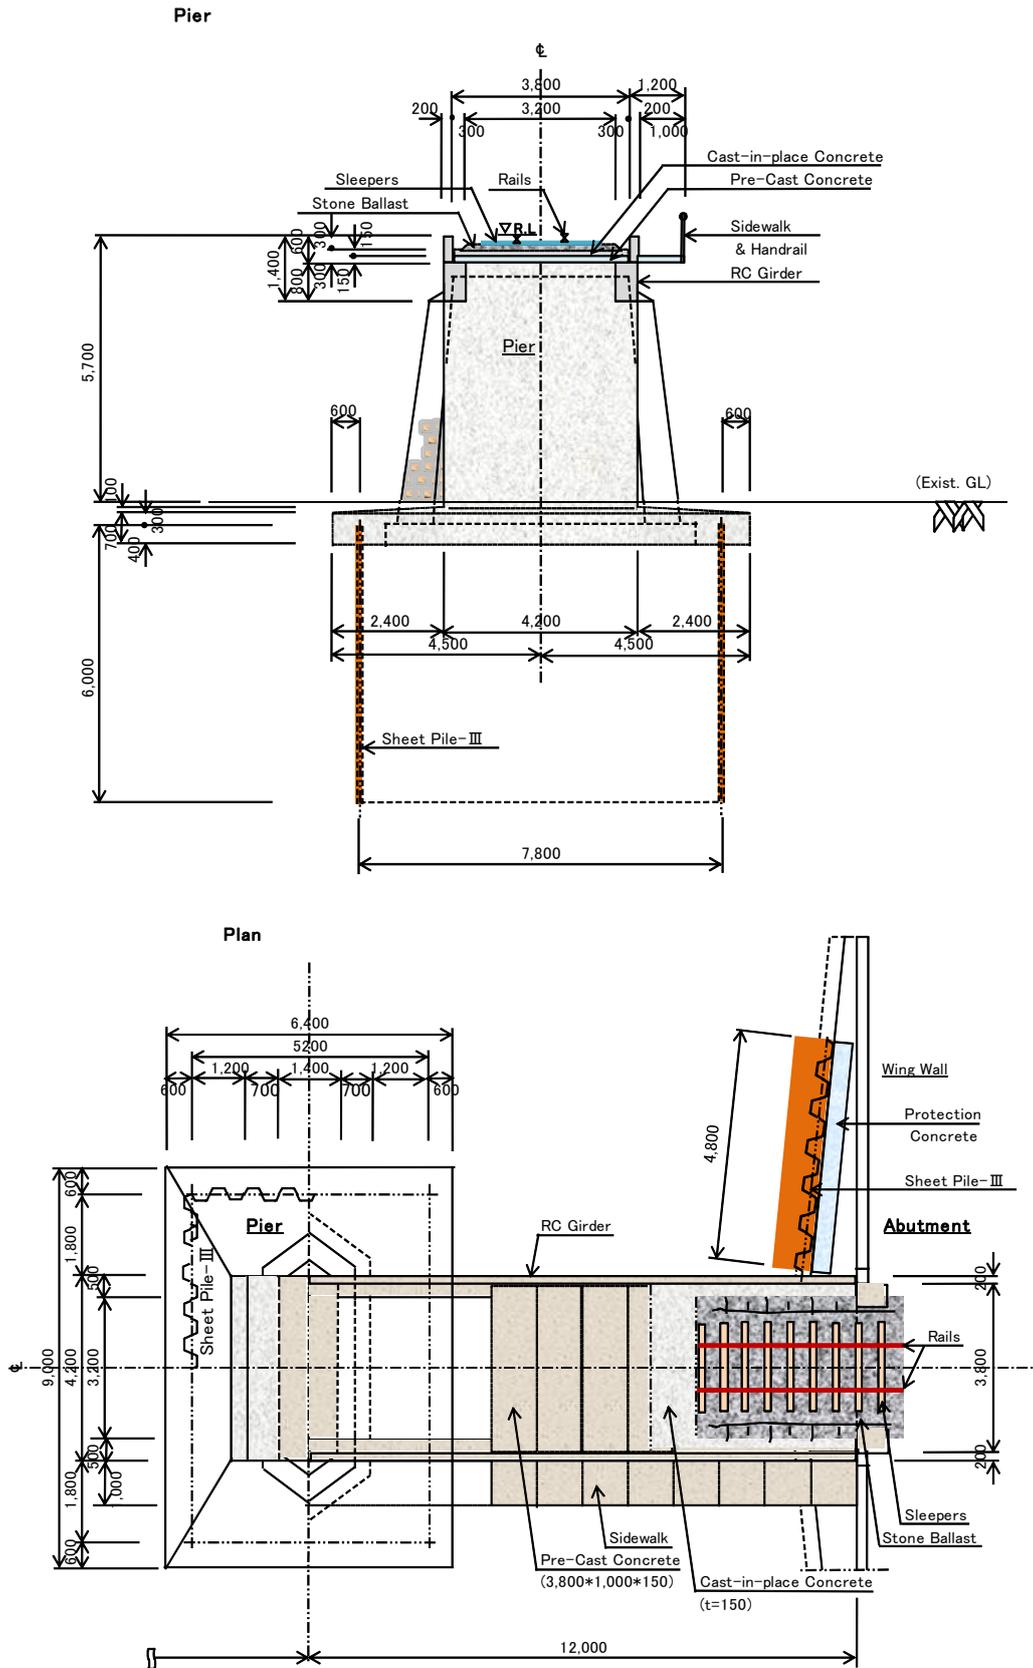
RC Bridge (Reconstruction Plan, 2/2)
